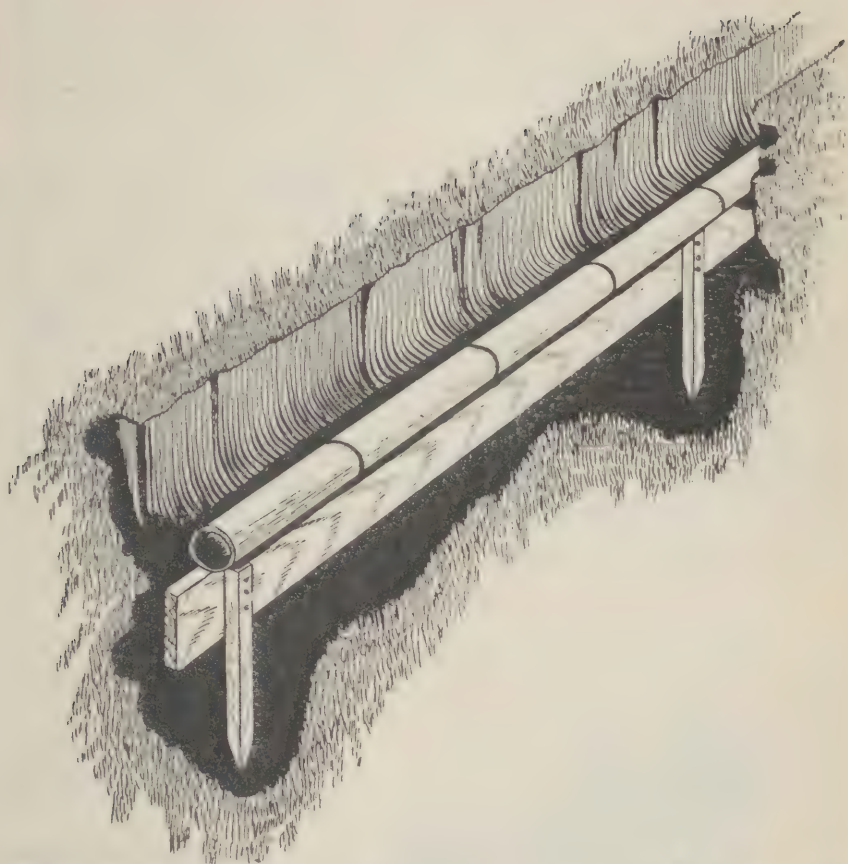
Showing method of supporting tile to prevent settling of tile line. The trench has not been back-filled and the upper surfaces of the tile joints have not been covered.
